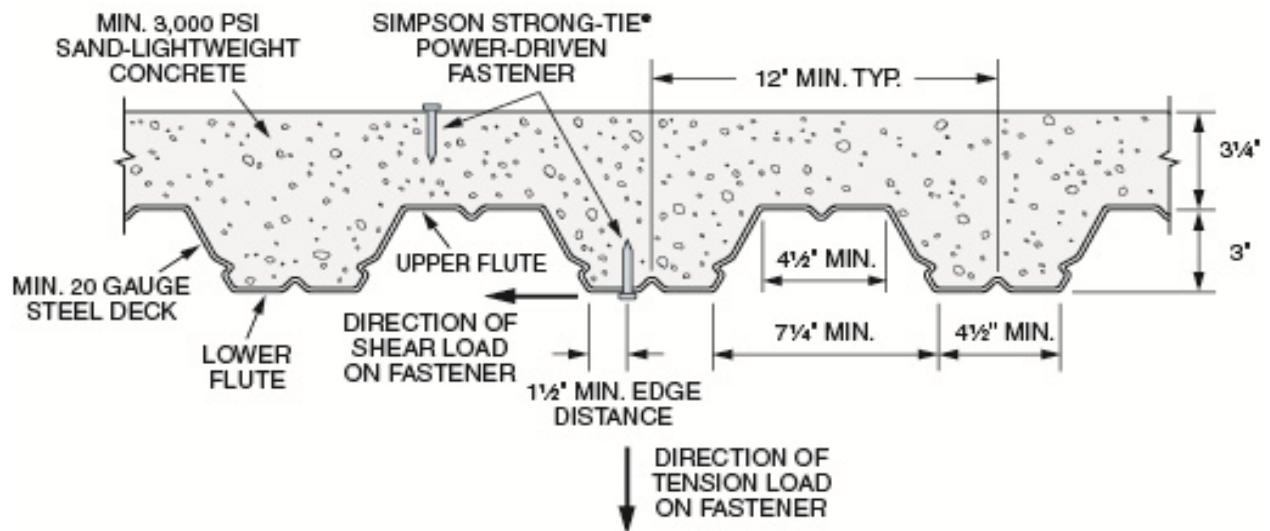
INSTALLATION IN CONCRETE FILL OVER STEEL DECK
